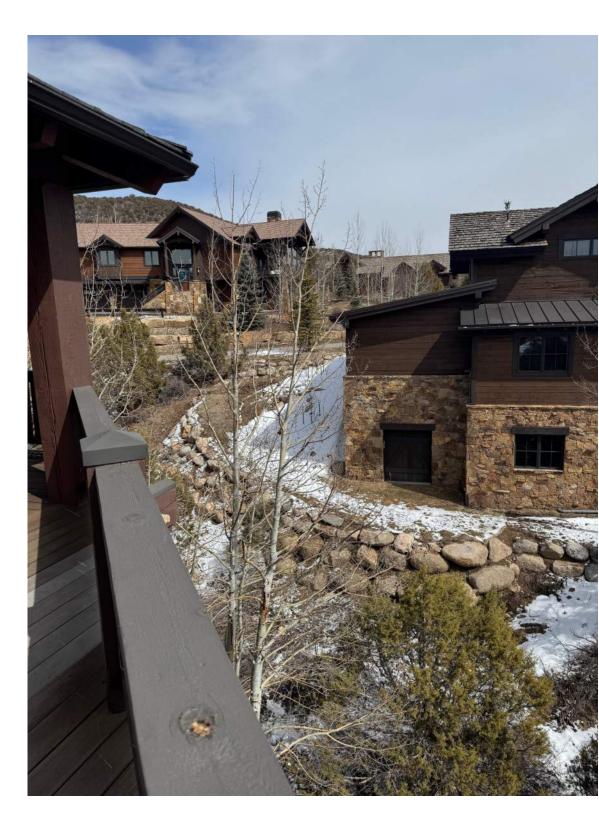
PHOTO FROM WEST NEIGHBOR DECK LOOKING AT 3RD CAR GARAGE/CART GARAGE
